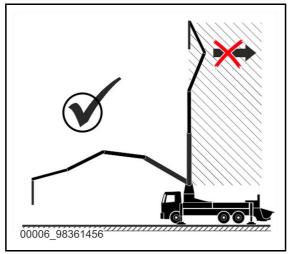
Warning sign on the machine: Do NOT place the end hose in backwards position!
